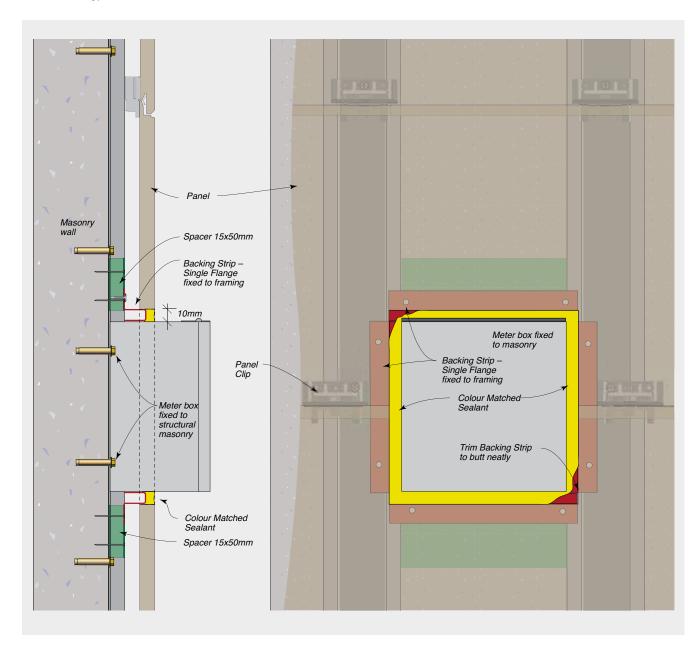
Typical Power Meter Box Installation – Elevation
